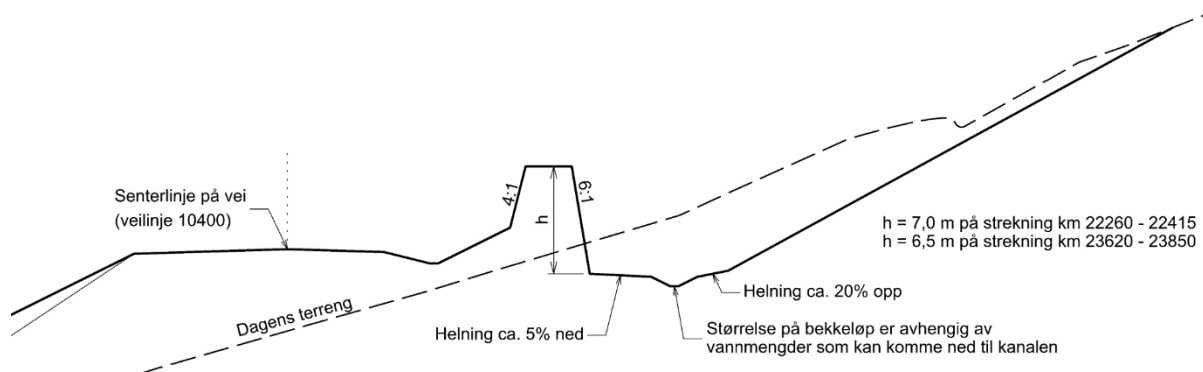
Typical cross section in planned road and a catching dam in Nordbotn.
